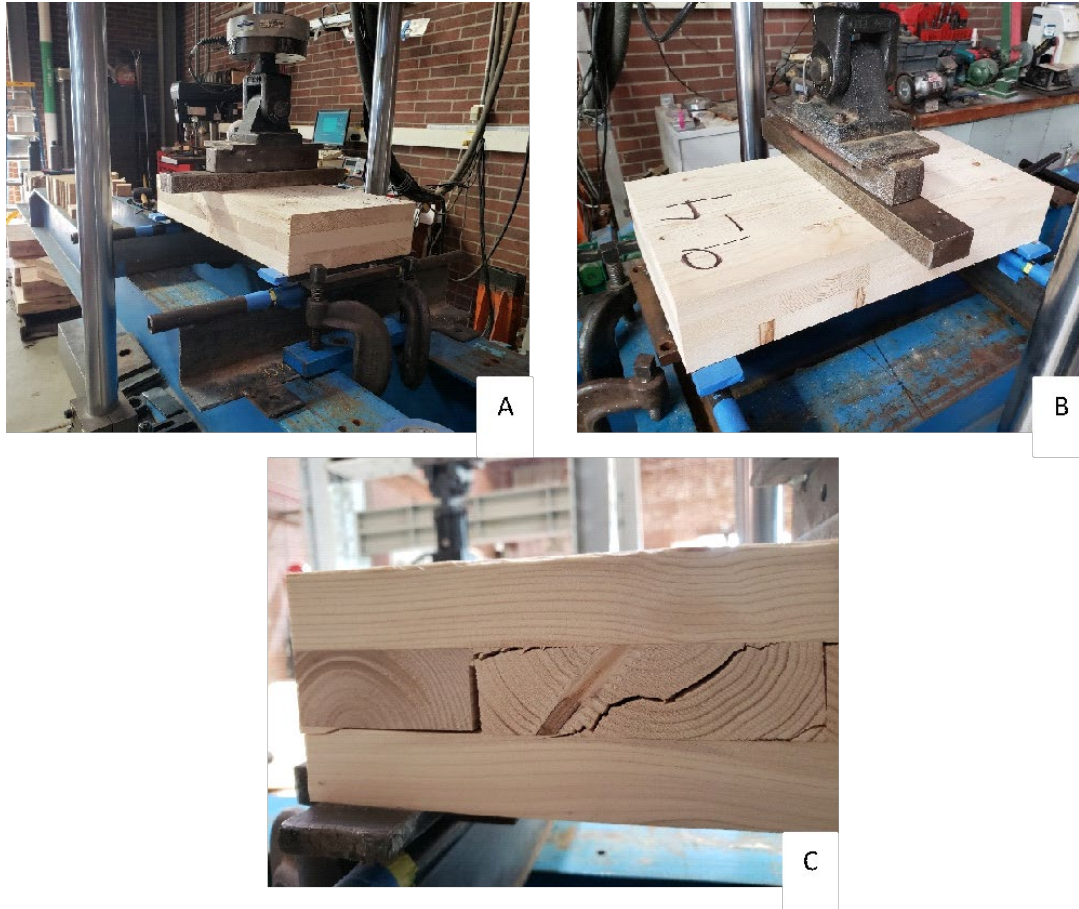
(A) and (B) short span testing setup side and top view, respectively. (C) Typical sample failure, failing in shear
